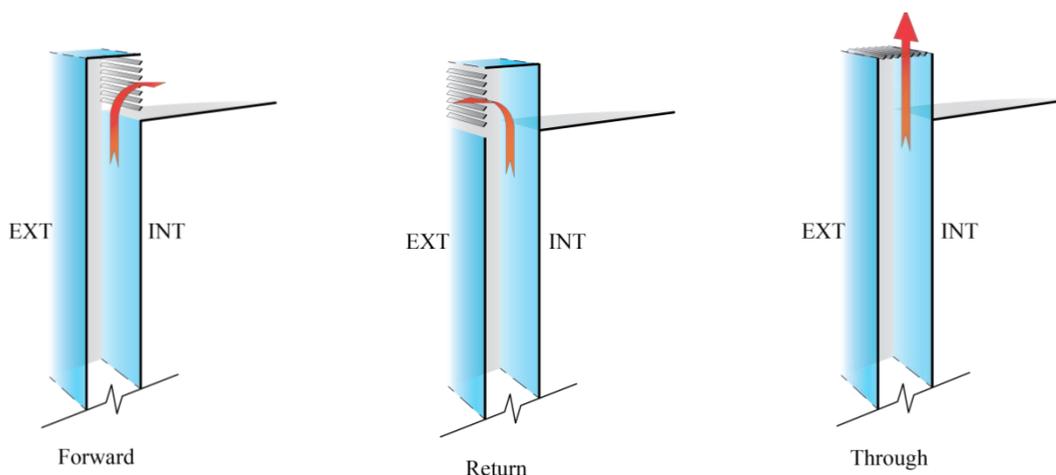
Multi-story DSF airflow exhaust (outlet) configurations.
